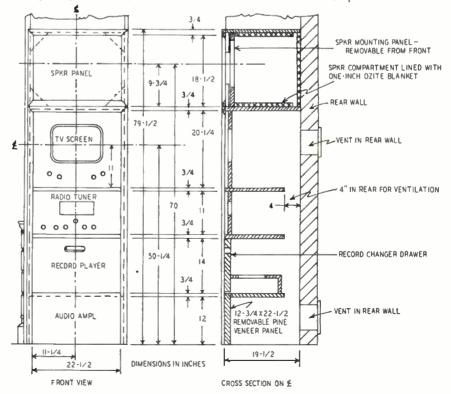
A front-panel view and cross-section of the installation in Fig. 1.
